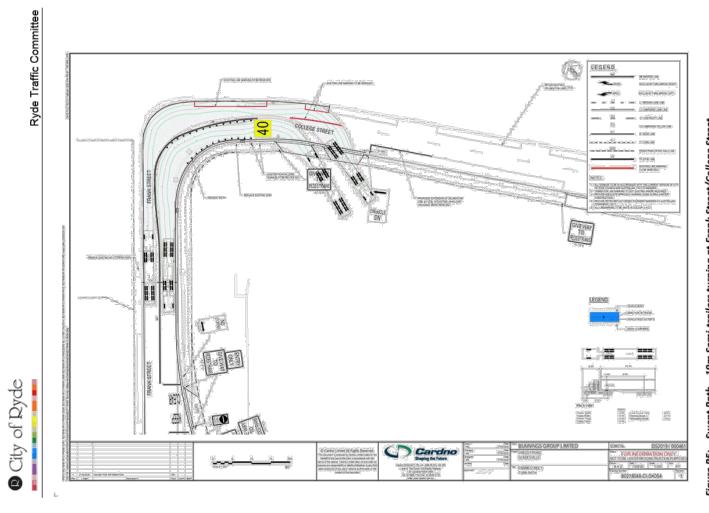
Swept Path – 19m Semi-trailers turning at Frank Street/College Street
